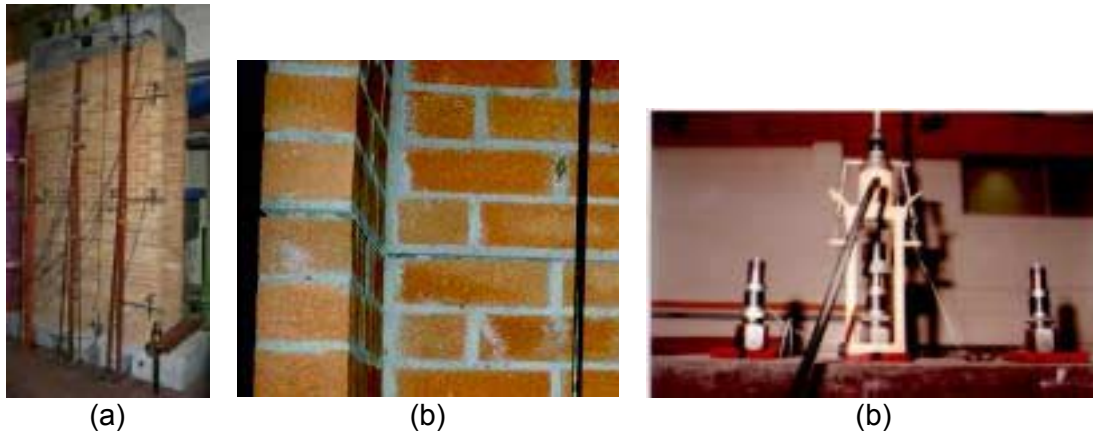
(a) post-tensioning using FRP, (b) flexural crack in post-tension wall, (c) post-tensioning jacking frame (ISIS)
